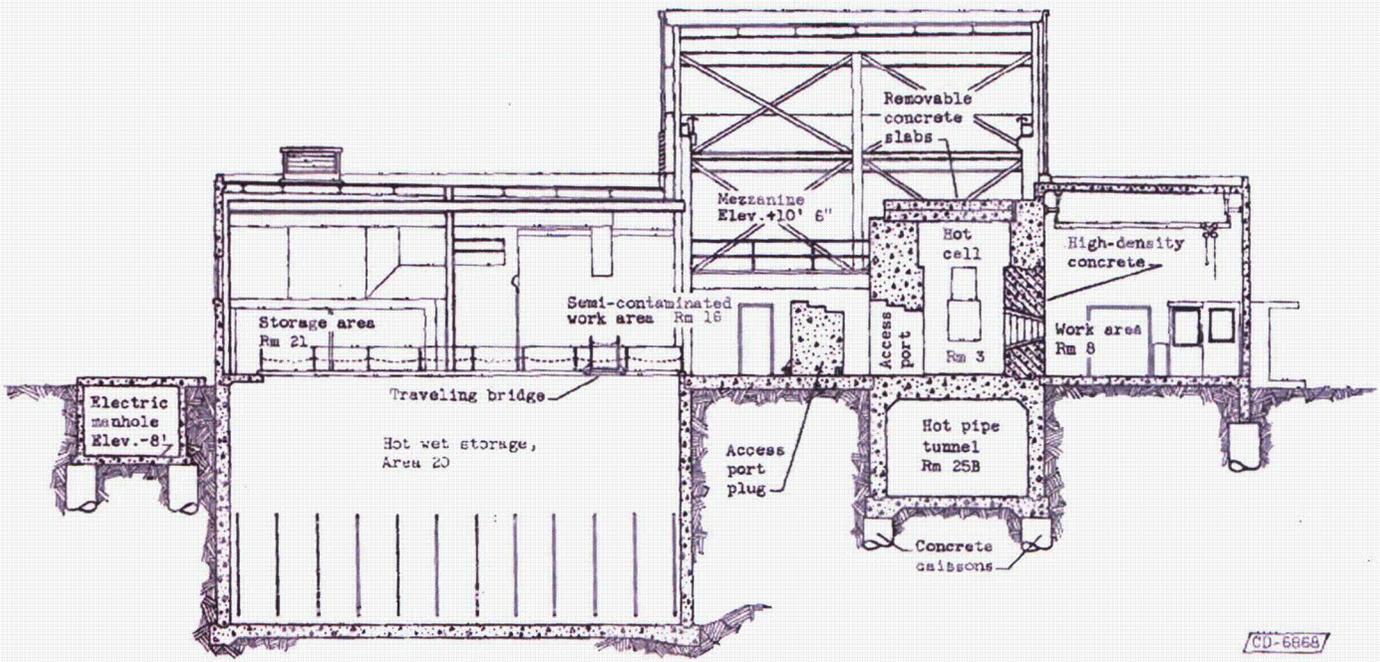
LESS CONCRETE UNDER HOT STORAGE
